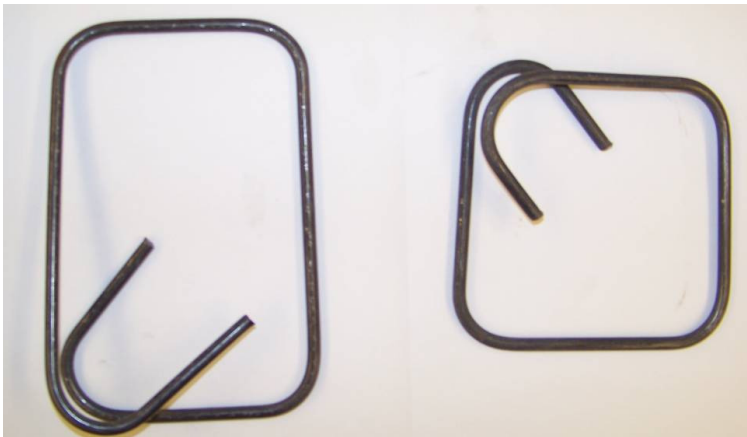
Transverse reinforcement used to tie beam and column, respectively (Fisher 2009)
